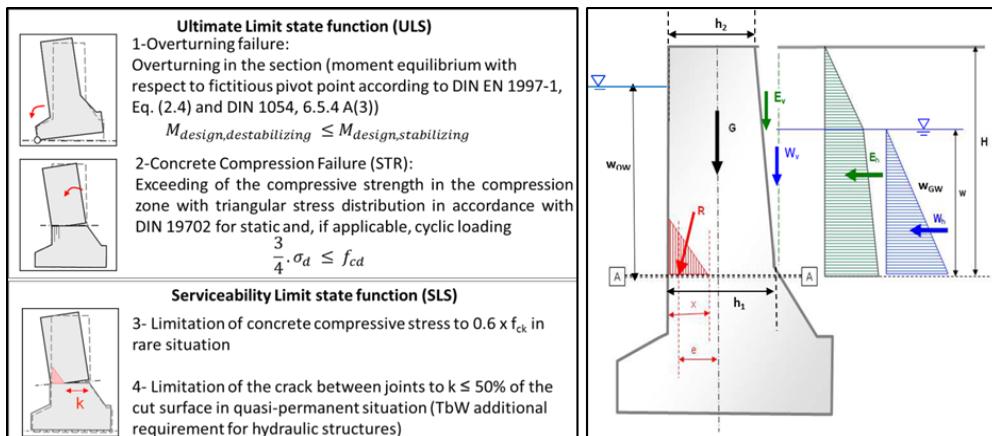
(Left) considered Limit state functions (ULS & SLS); (Right) Typical geometry and load system for a ship lock wall structure (adapted)
